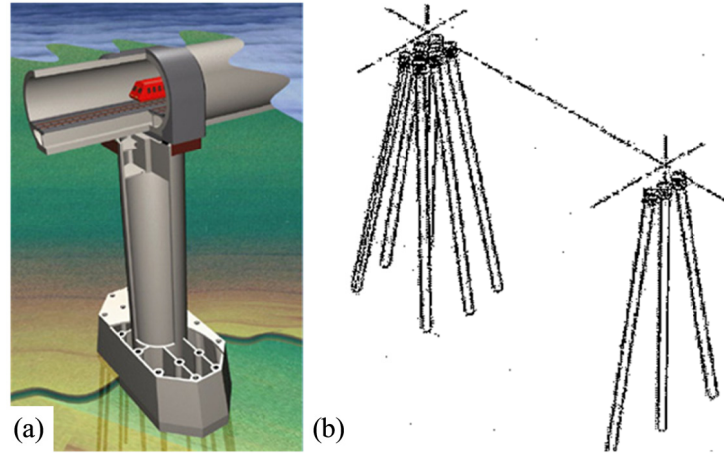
(a) Pier supporting the tunnel of the SFT crossing the Lugano Lake (Haugerud et al., 2001); (b) Groups of piles supporting the SFT crossing the Washington Lake (U.S.A.; Felch et al., 2003).
